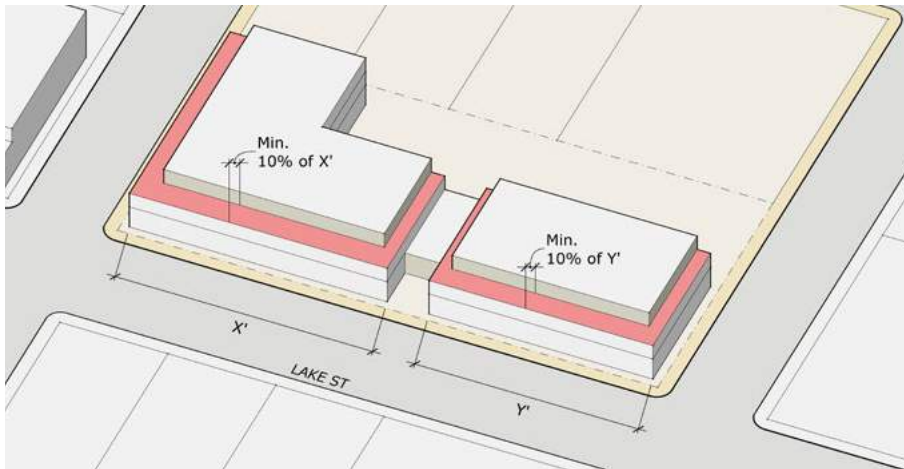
Provide a stepback at the upper story of developments to reinforce the building streetwall and allow for increased vertical rhythm along the façade.
